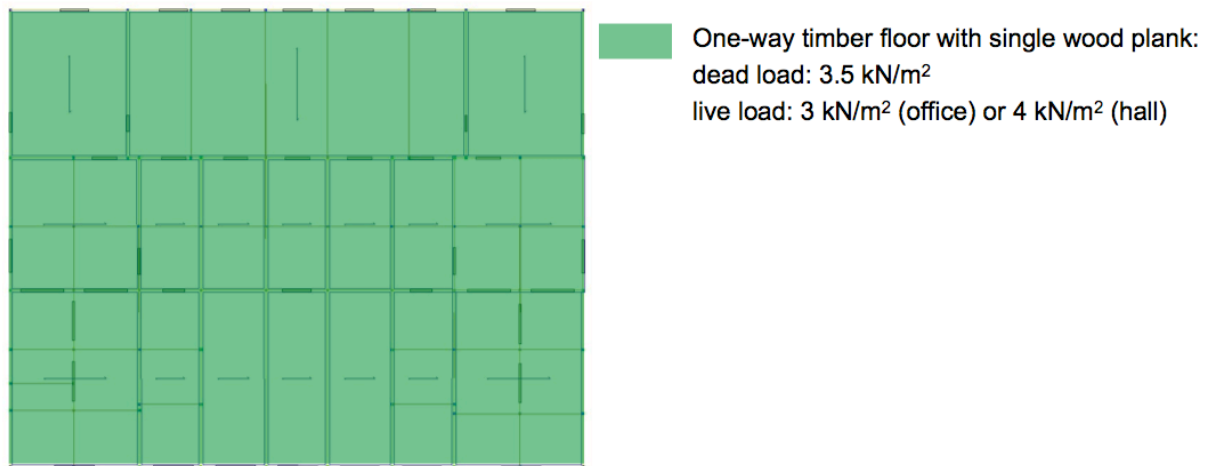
Third floor on second floor (3.OG on 2.OG)
